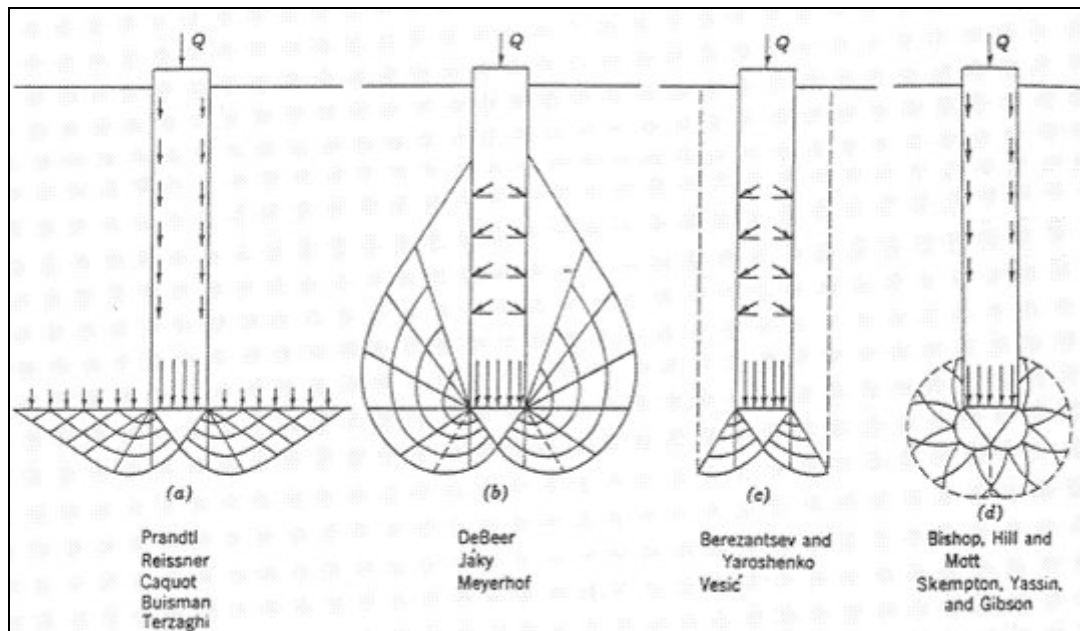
Typical failure patterns that might occur under deep foundations (ref. 23).
